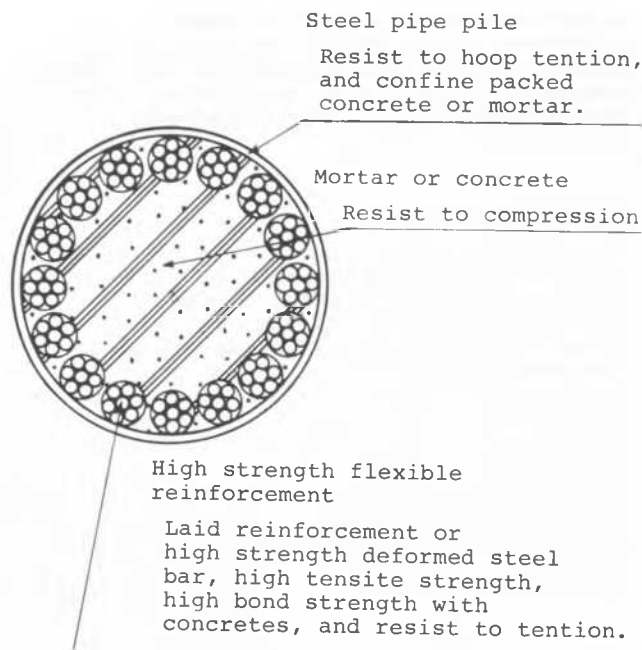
Cross section of flexible reinforced concrete pile with steel pipe pile (after Fukuoka)
